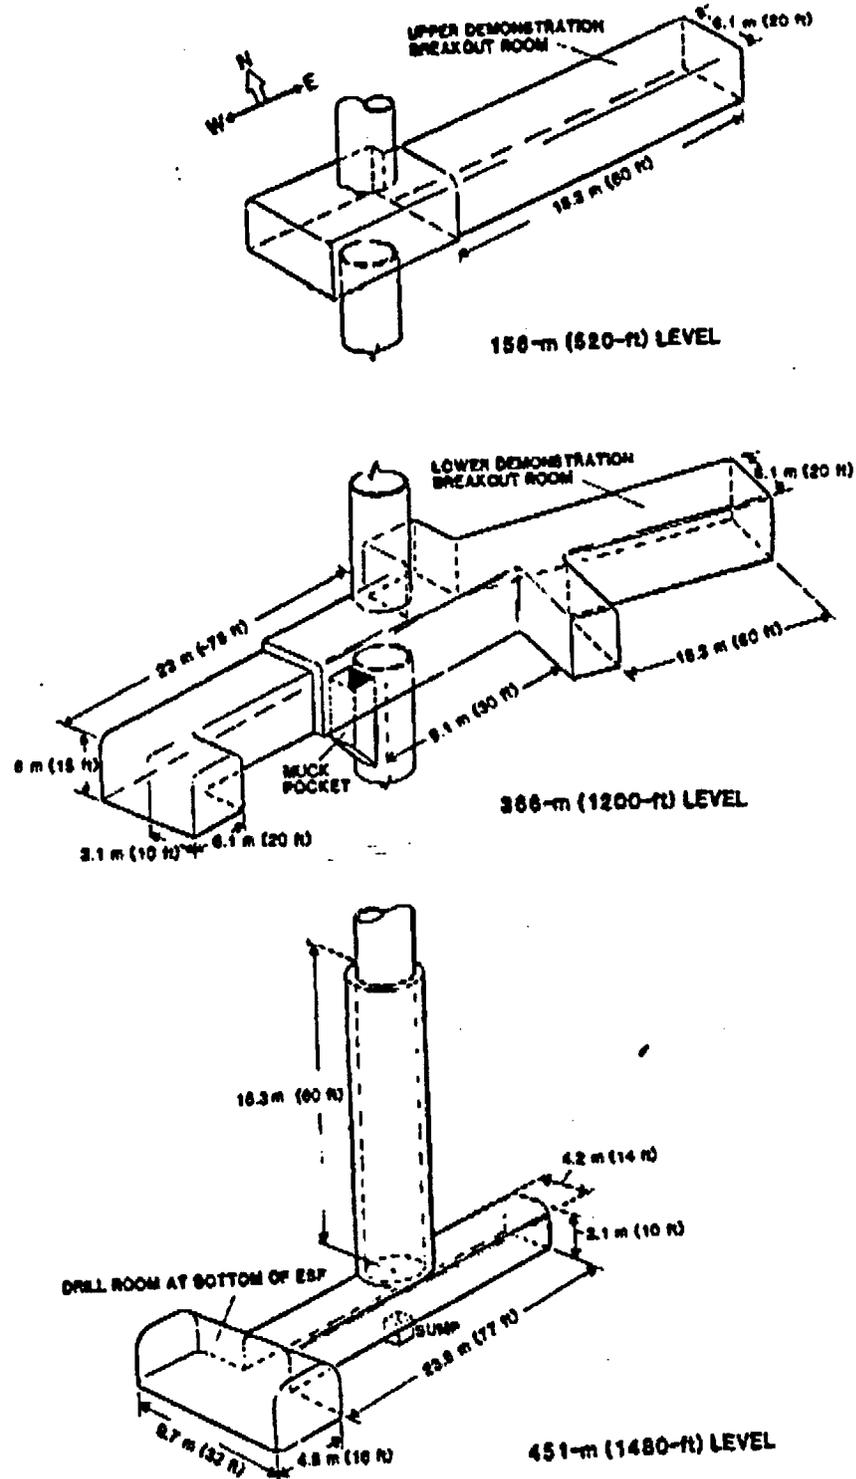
Drifts and rooms to be constructed during ESF sinking. Drifts and rooms for the main test facility will be constructed at the 366-m (1200-ft) level off the west end of the landing.
